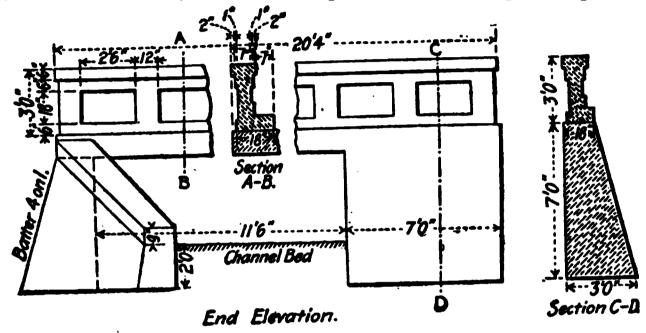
Showing raised parapet on skew bridge extended over straight parapet retaining wall.
